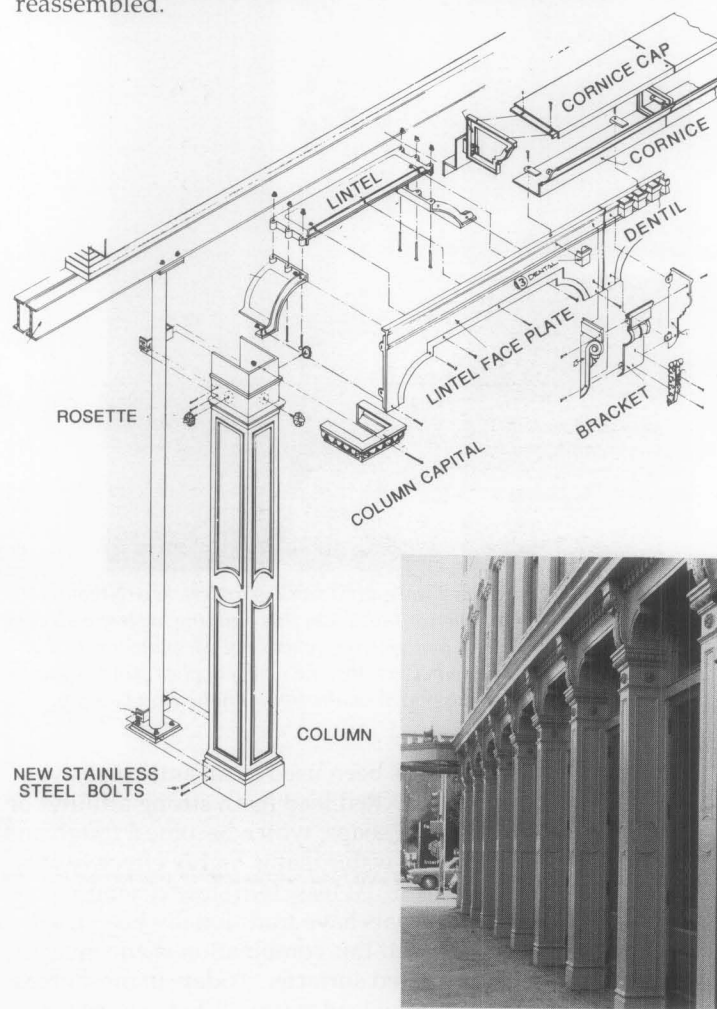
Architectural cast iron is made of many small components bolted and screwed together. (a) This exploded view of a storefront illustrates the variety of elements, including brackets, fasteners, and holes for bolts. (b) The storefront was replicated in cast iron because of the extensive damage and structural failure, a detail of which is shown in Fig. 11. Drawing and photo: Historical Arts & Casting, Inc.
